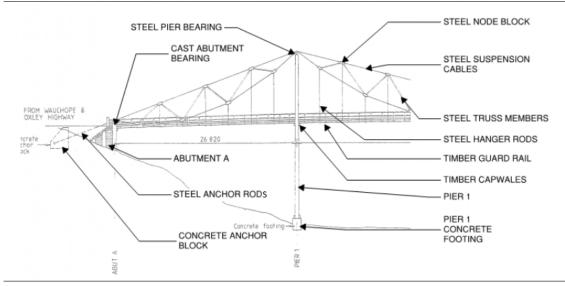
Illustration of Technical Terminology Used in This CMP - Bridge Elevation
